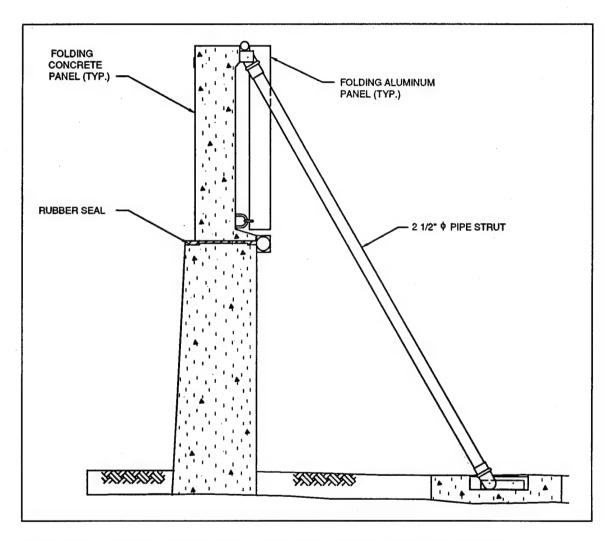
Typical wall section with lower panel erected, Bettendorf Floodwall
